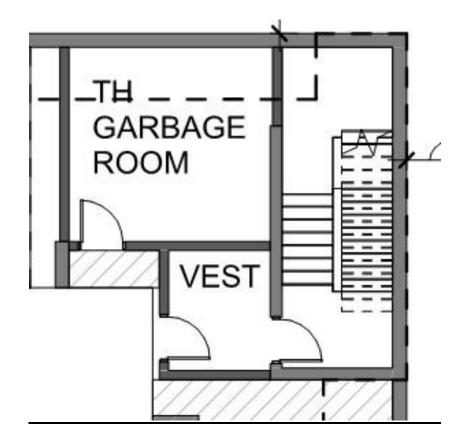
Block 2 Townhouse - P1 Level Collection Room
